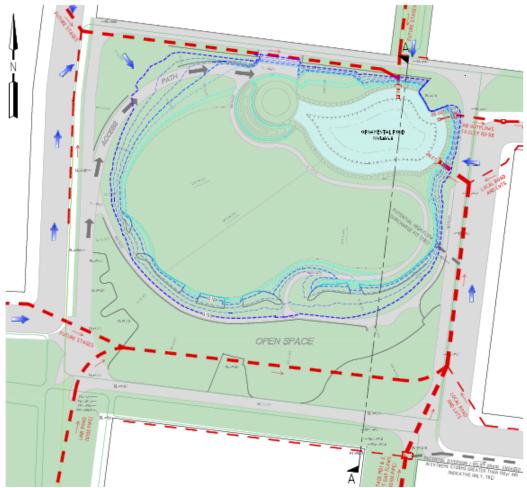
The Proposed Central Park Retarding Basin Layout
